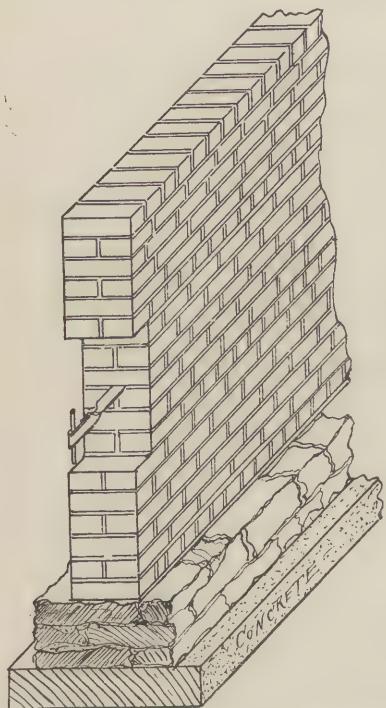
3-IN. INSIDE WALL, SHOWING HEADING FOR TYING INTO WALL AT RIGHT ANGLES.
